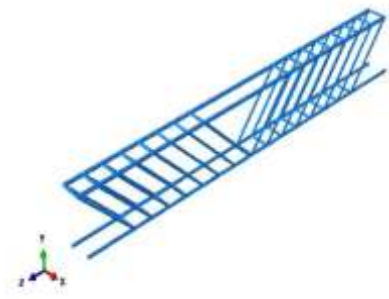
Reinforcement and Inclined Stirrups 3D modeling.
